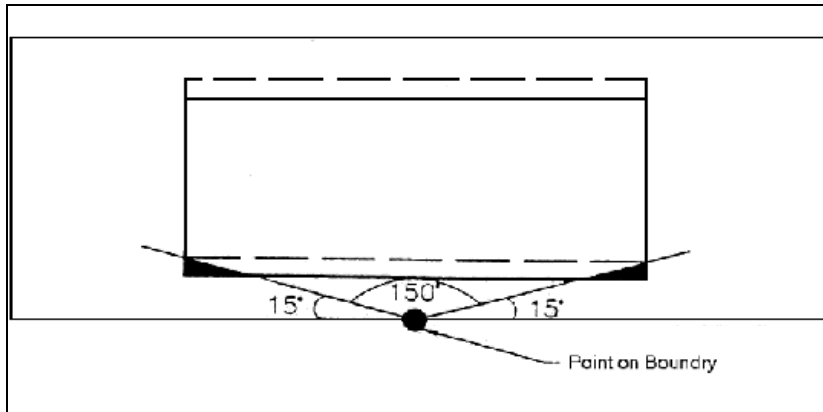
Example of a unit built within a 150 degree angle, centred on the boundary.
